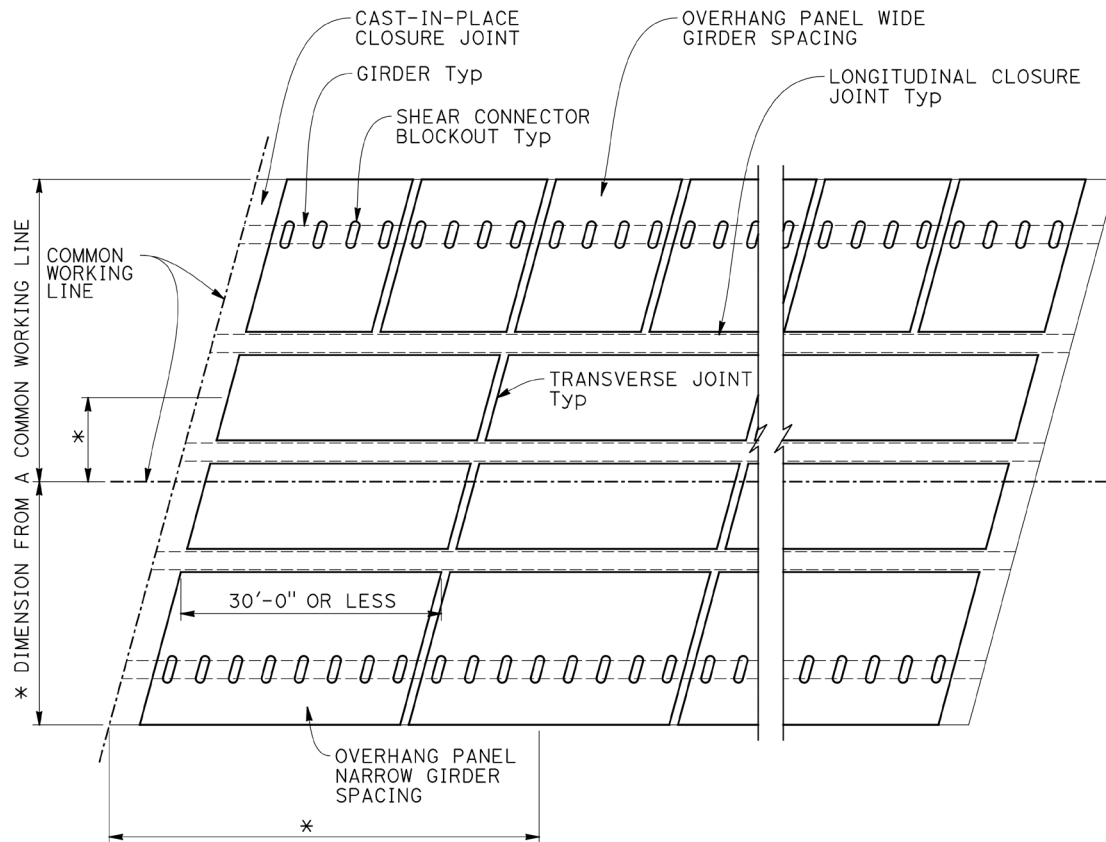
Longitudinal Full Depth Deck Panel Layout (Skew $\leq 25^\circ$)
